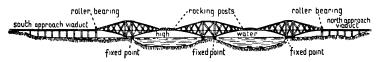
SECTION OF THE FORTH BRIDGE.
